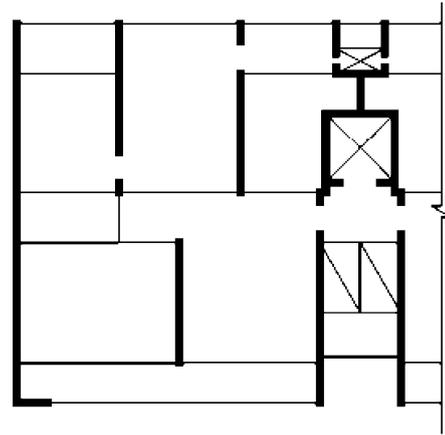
One of examples of structure with shear walls developed in the 1980s (bold lines: Shear walls, thin lines: bonded brick wall).
